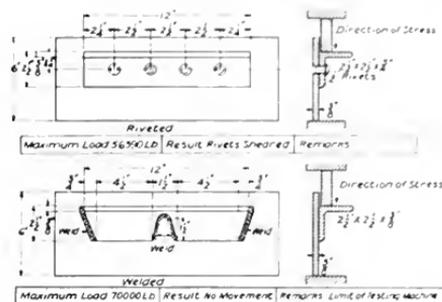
Tests to Determine Relative Value of Riveting and Welding for Bracket Connections, etc.
